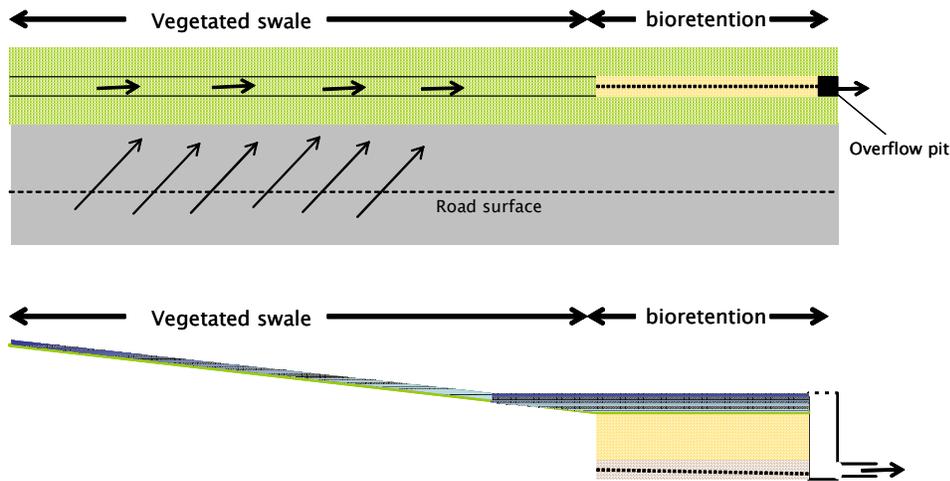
Plan and Longitudinal section of typical roadside bioretention swale
